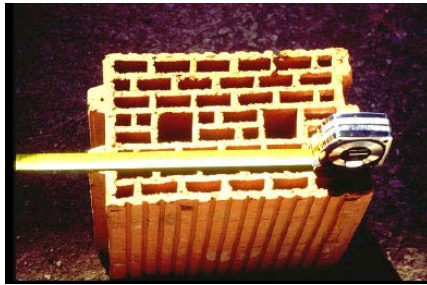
E: Critical Structural Details - Typical Hollow Clay Tile Infill Block (EERI 2000)
